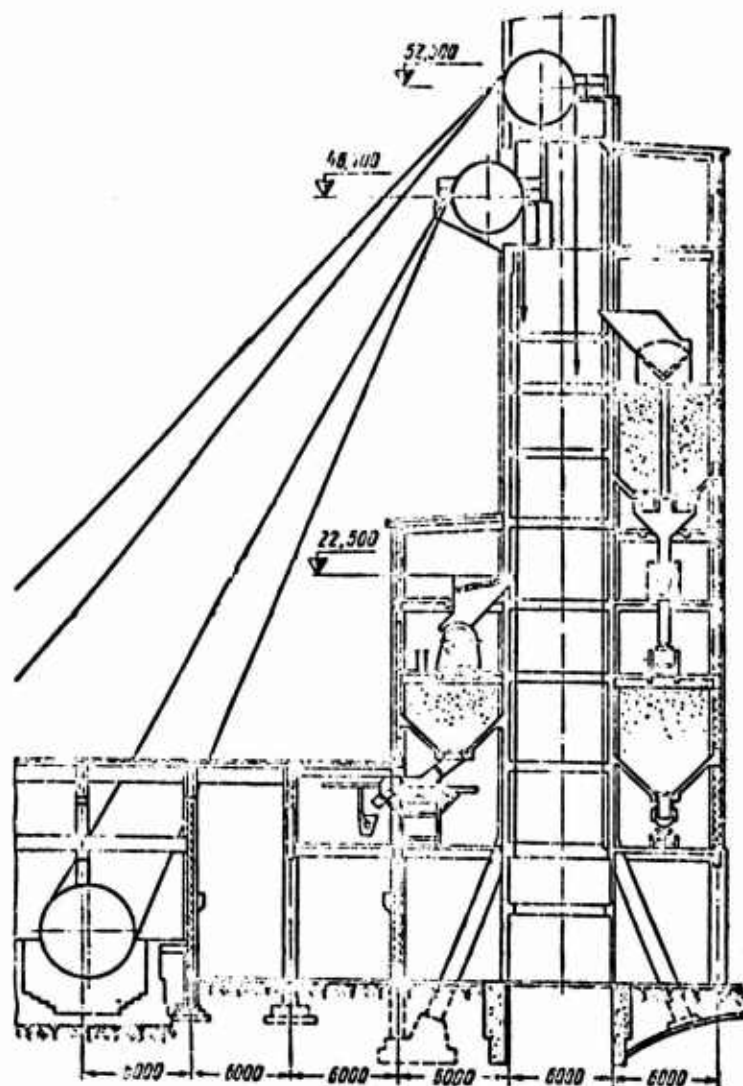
Boomless ferroconcrete monolithic pile driver, joined with receiving hoppers and a deckhouse building (pile driver hopper).
